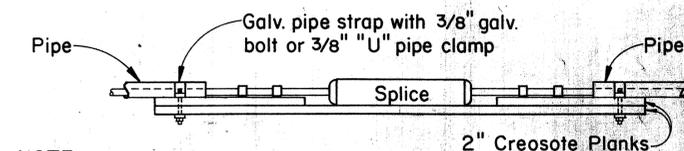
DETAIL OF CABLE CROSSING OVER STORM CULVERTS-IRRIGATION PIPES, OTHER UTILITIES, OR FOREIGN PIPES
